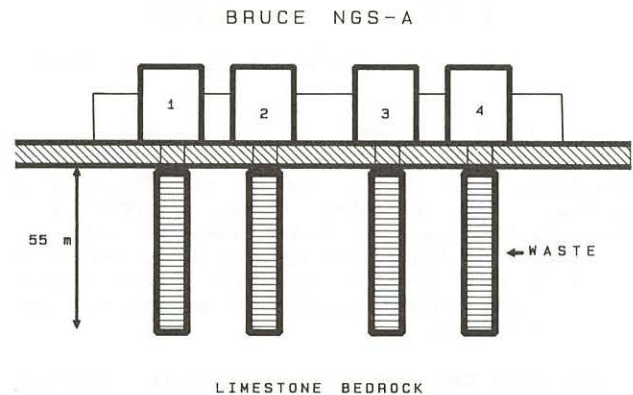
ARRANGEMENT OF BURIAL PITS FOR ON-SITE BURIAL OF DECOMMISSIONING WASTE AT BRUCE NGS A
